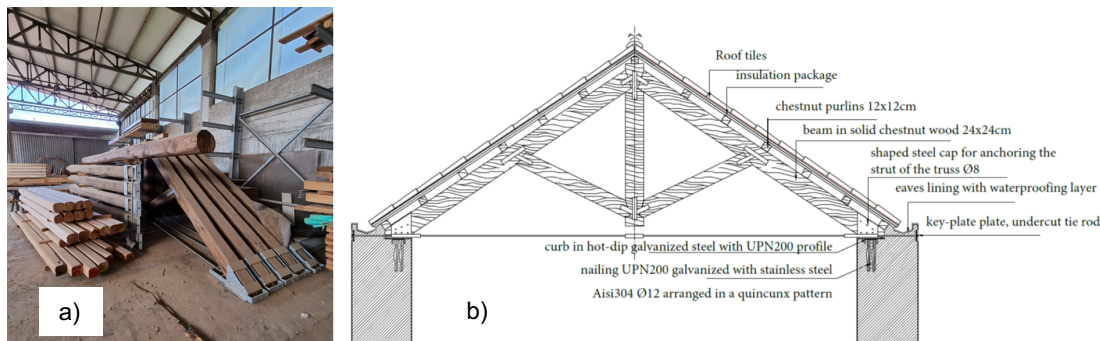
Timber trusses. a) Factory storage b) cross-section picture (Source: Authors 2022)
